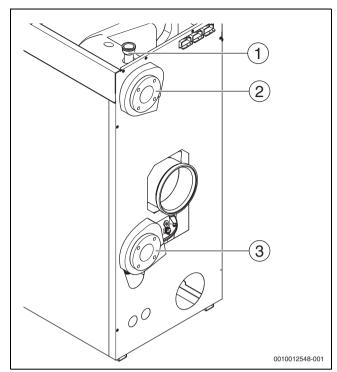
Hydraulic connections at the boiler (the boiler shown has a flanged connection, right-hand version)
